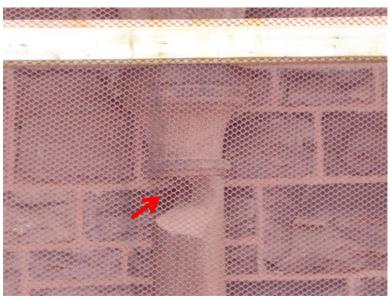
Containment netting installed at a column where large pieces have spalled and fallen from the building.
